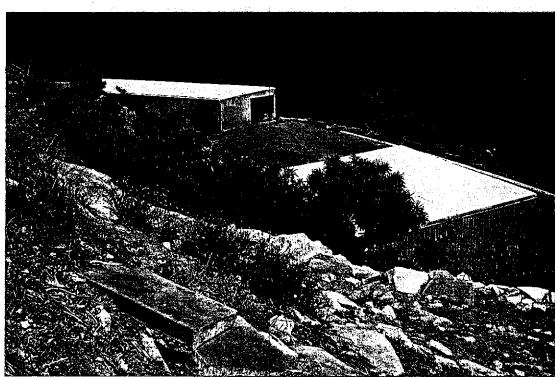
September 2005 site photo. Debris on upper slope; looking down at unpermitted sheds and paved lower building pad.
